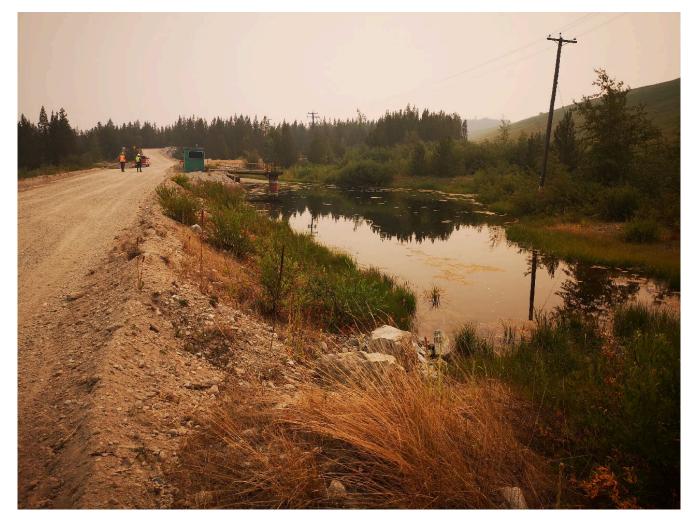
S8 Pond: View of impoundment, catwalk and outlet pump to S1 Pond (HGH-2021-40 and HGH-2021-41).
